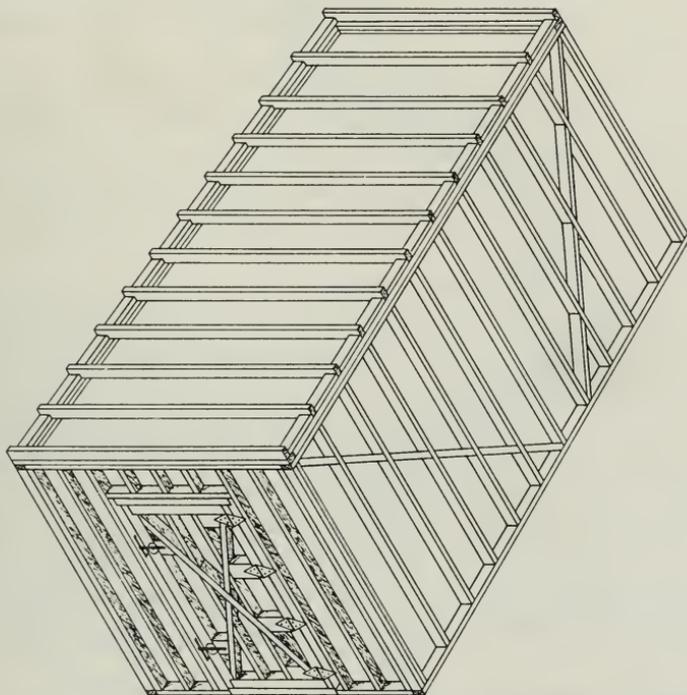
Gastight fumigation chambers should be used. The design shown is that of a satisfactory permanent structure; it has a concrete floor, and panel walls without outside framework to facilitate tighter wall construction. (Detailed plans for the construction of these chambers are available from the Dried Fruit Association of California, San Francisco, Calif.)
